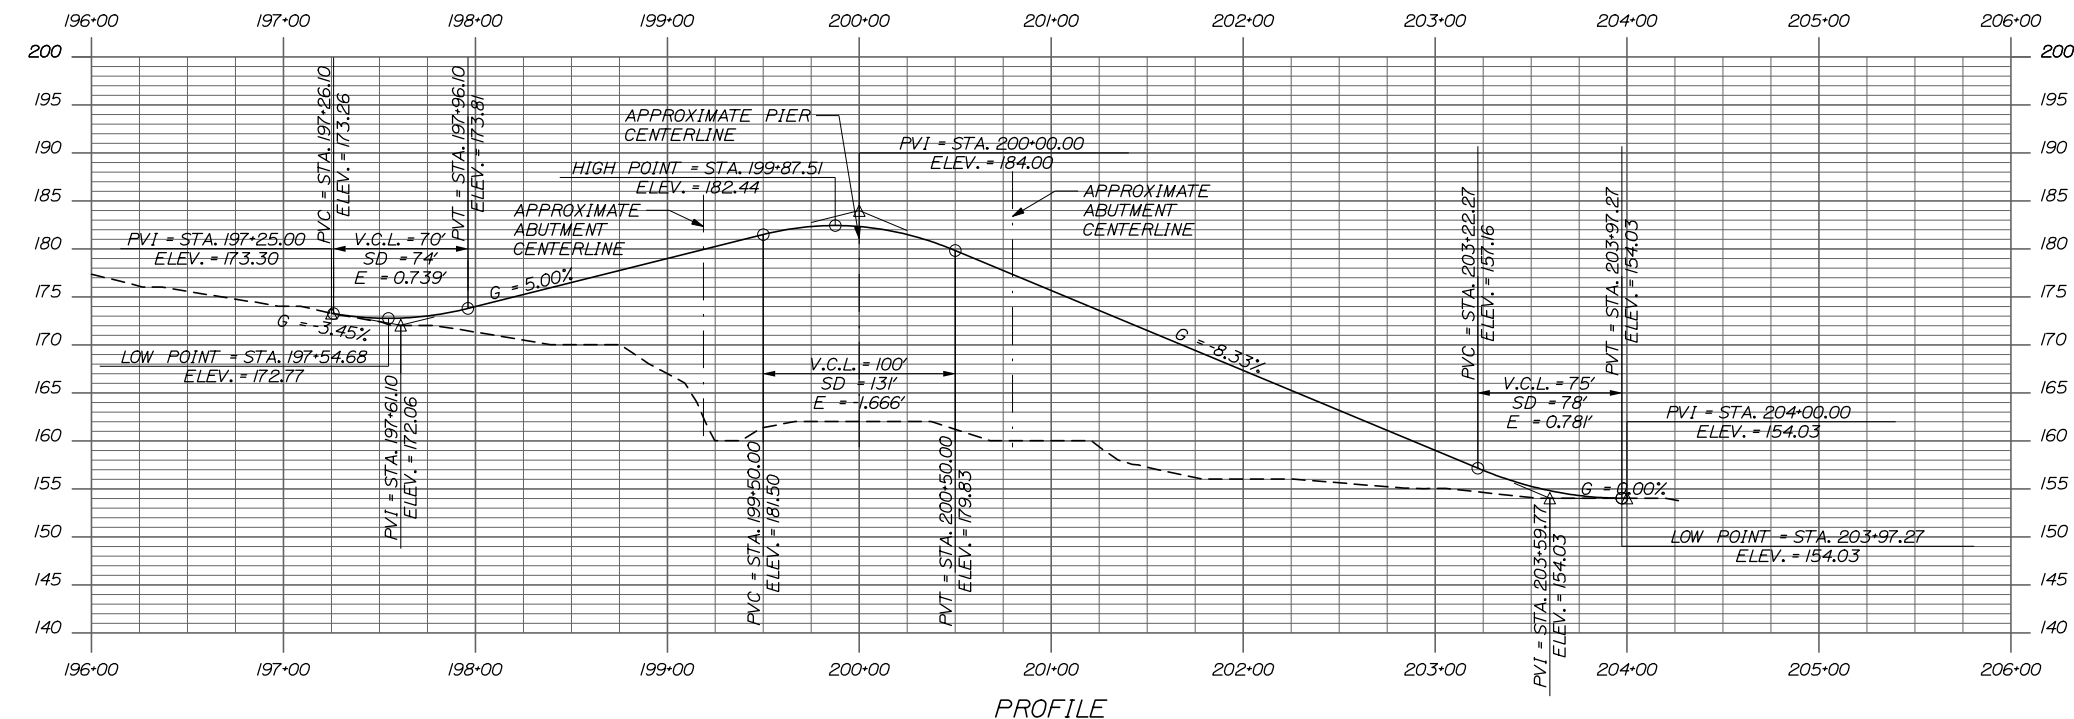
POTENTIAL BRIDGE LOCATION M
